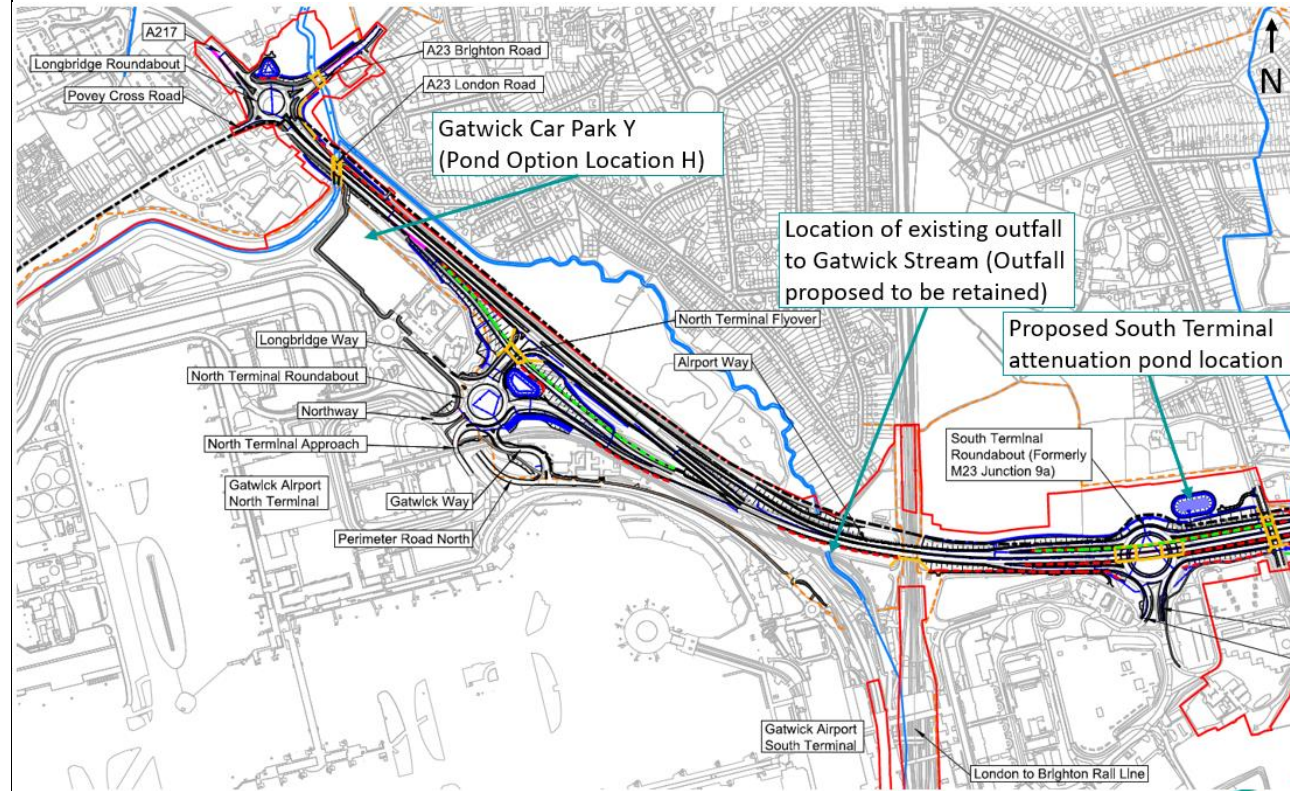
Potential Alternative Drainage Attenuation Feature Location H overlain onto extract of Surface Access General Arrangement Plan
